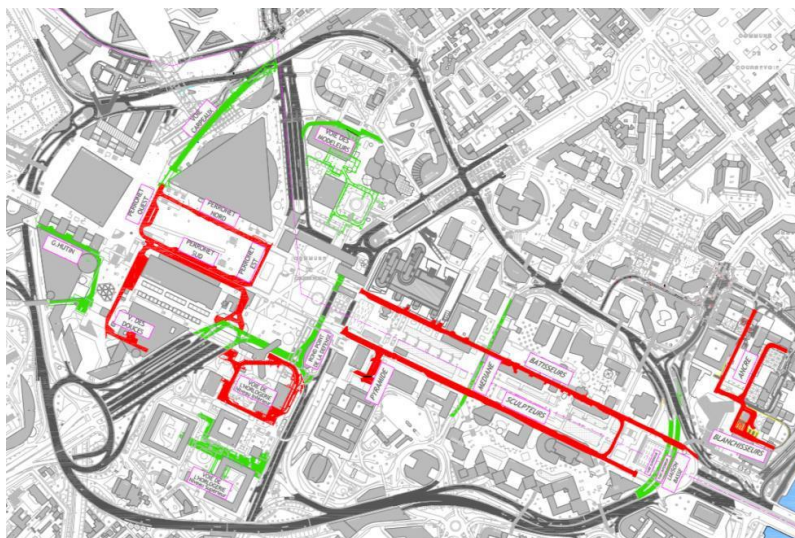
La Defense district, tunnels, and underground facilities are marked in red or green.
